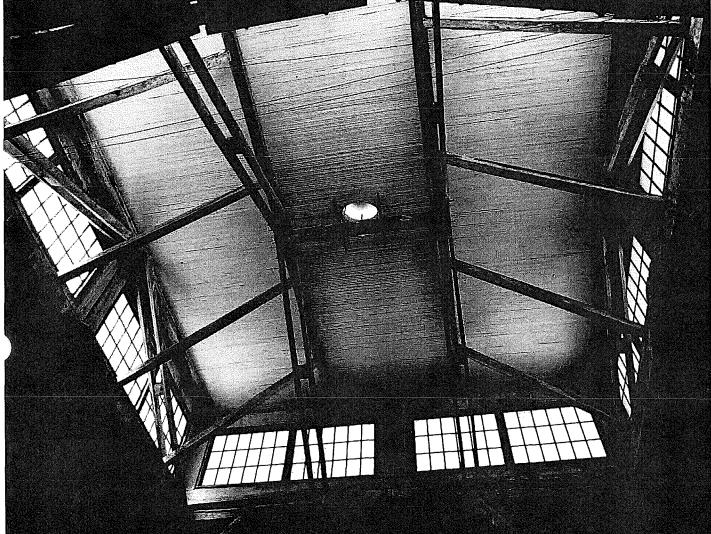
View of a timber roof pop-up area with shoring work on wood beams and replaced roof sheathing
